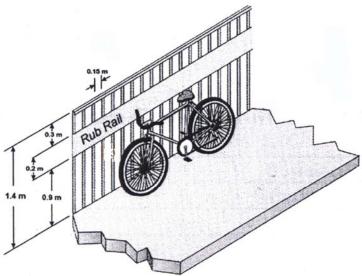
in the Bicycle Facility Design guidelines outlines rub rail details on multi—use crossings.
